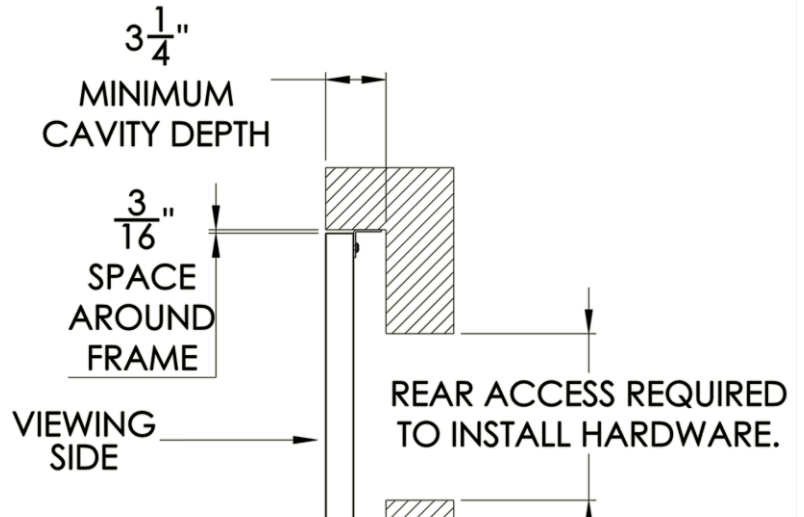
Side view profile drawing of WSDQ showing overall depth and OD size of aperture needed to mount the frame.
